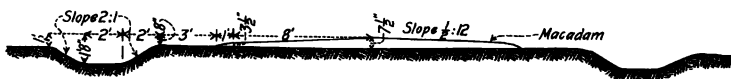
TYPICAL CROSS-SECTION OF MACADAM ROAD, AS RECOMMENDED BY THE AUTHOR.
